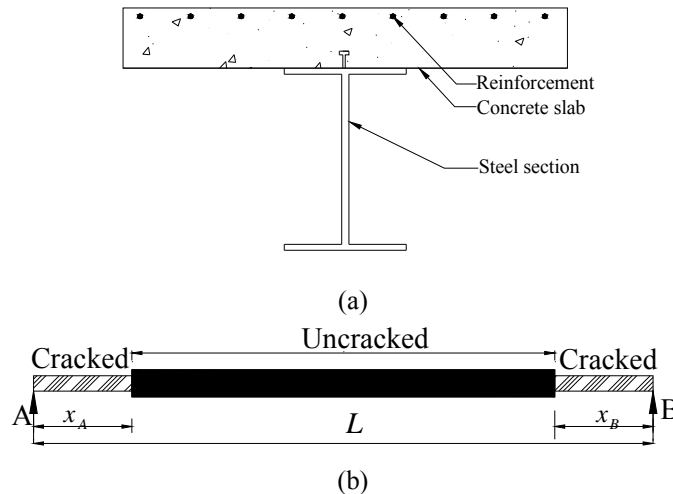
(a) Composite cross-section and (b) cracked span length beam element
